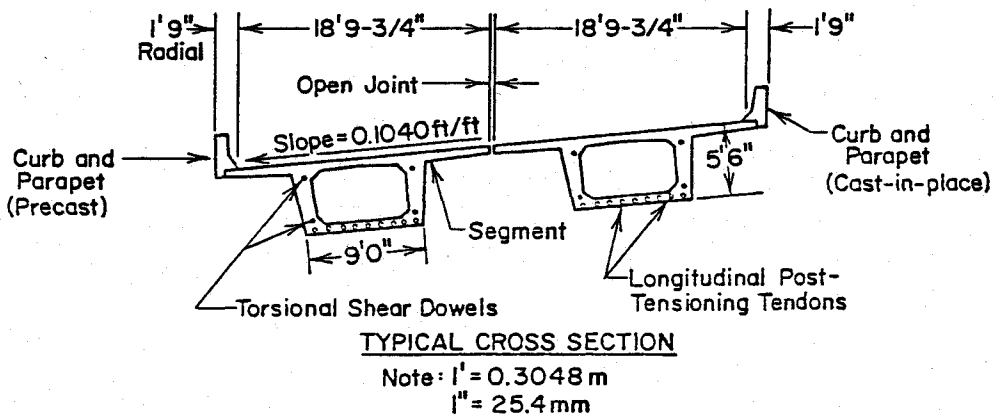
Typical cross section of experimental segmental box girder bridge.
